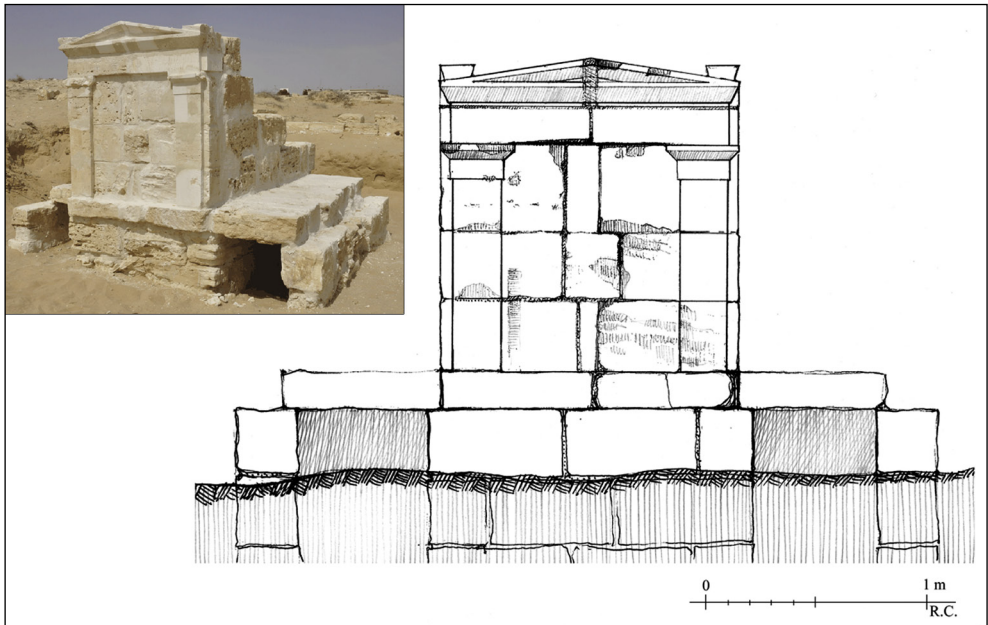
Reconstruction of the facade of Tomb T17: inventory drawing and view after anastylosis in 2011 (Photo P. Zambrzycki; drawing R. Czerner)
